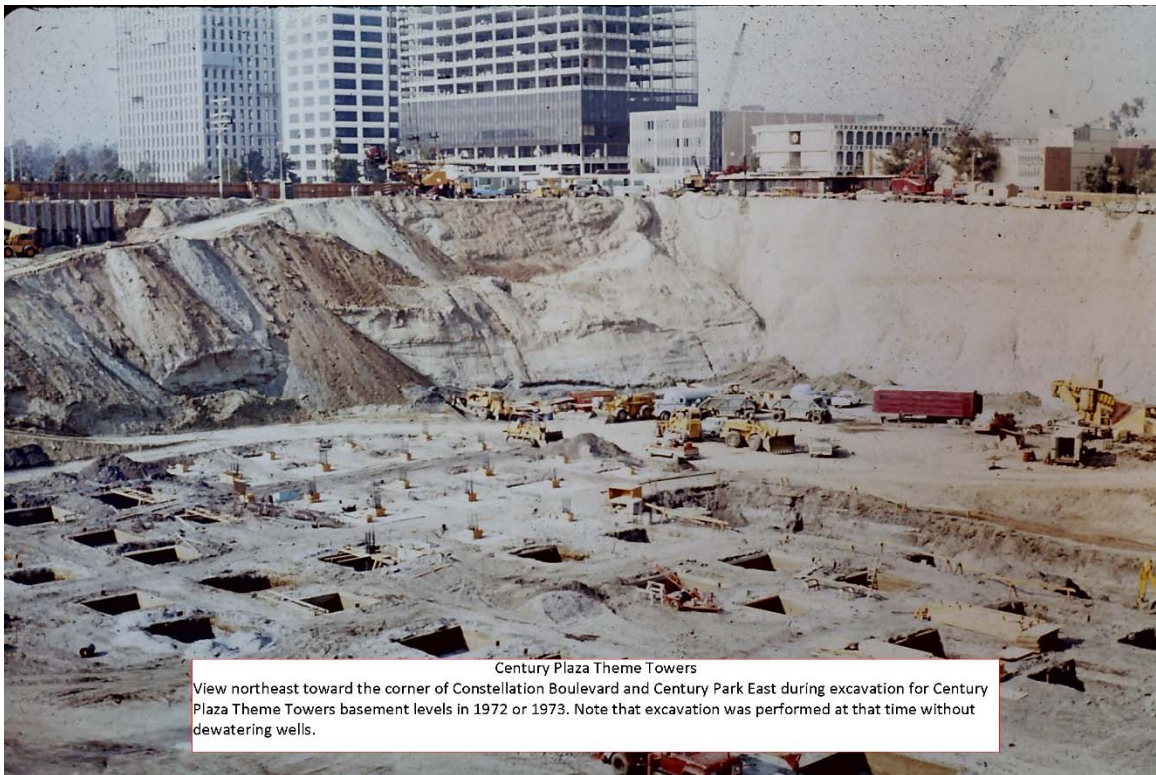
Century Plaza Theme Towers (Photo 2)
